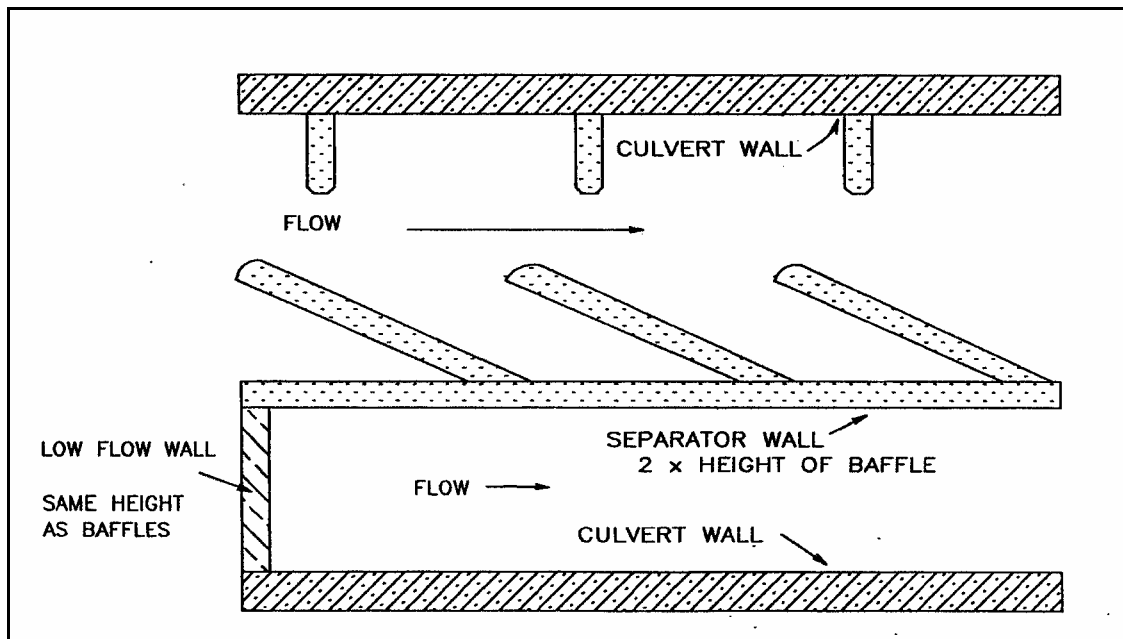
Washington Baffles with a separator wall – for culverts > 7 ft. width. (CDFG 1998)
